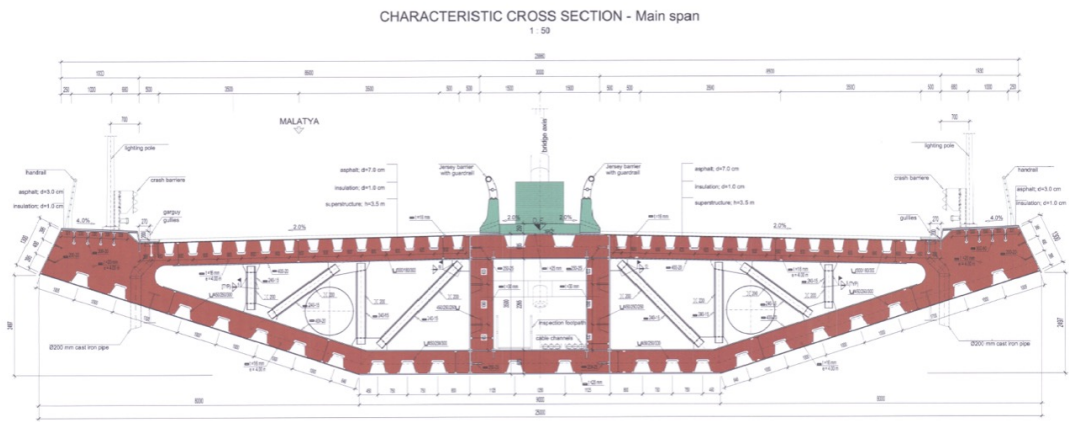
Cross-section of main span of New K m rhan Bridge.
